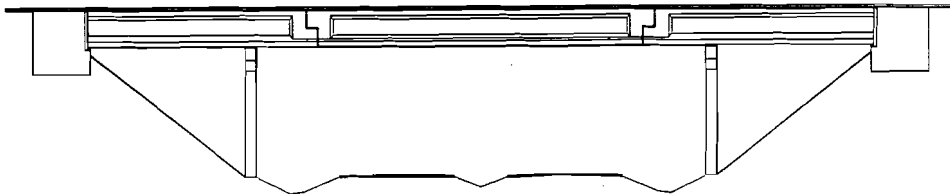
Three-span bridge with "semi-continuous" construction.
